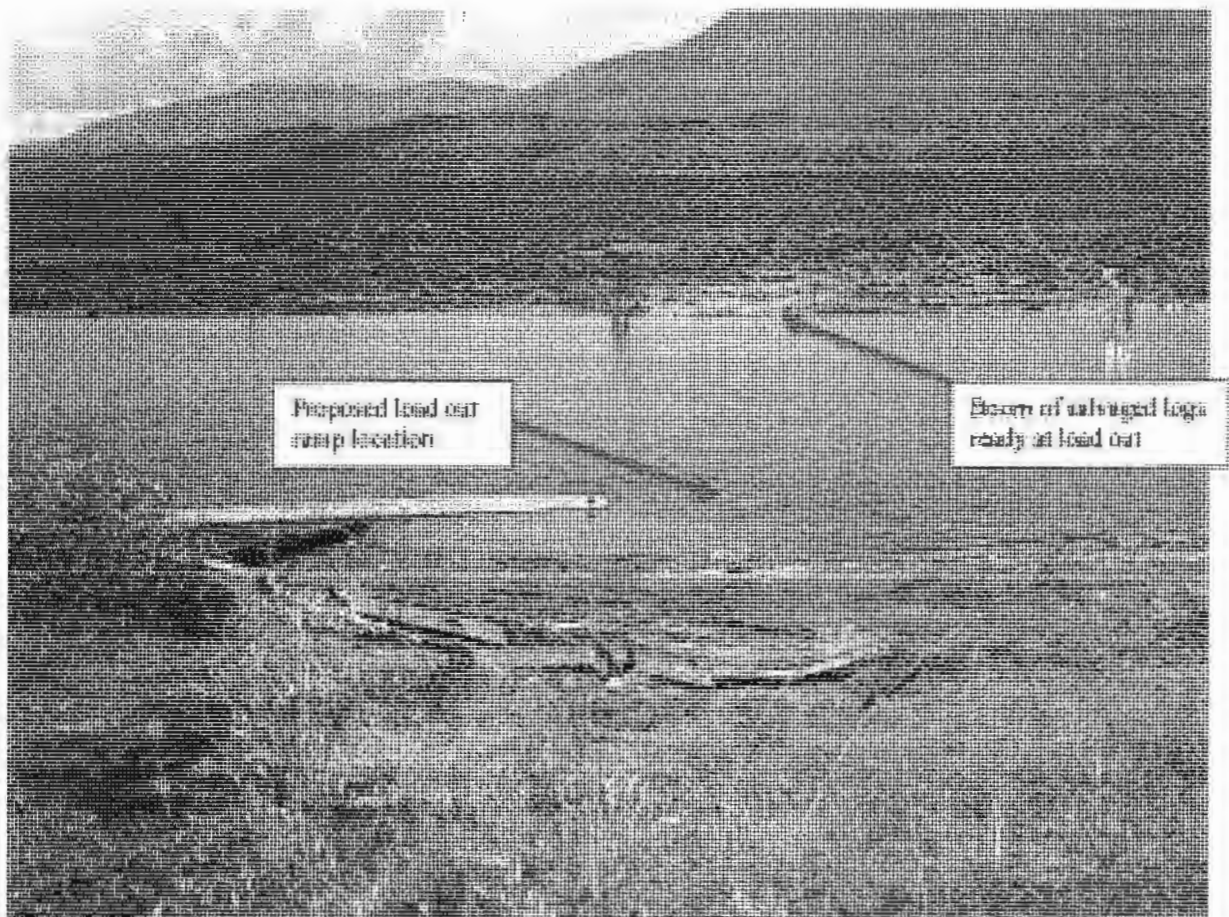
Existing boom of salvaged logs and proposed load out ramp location
